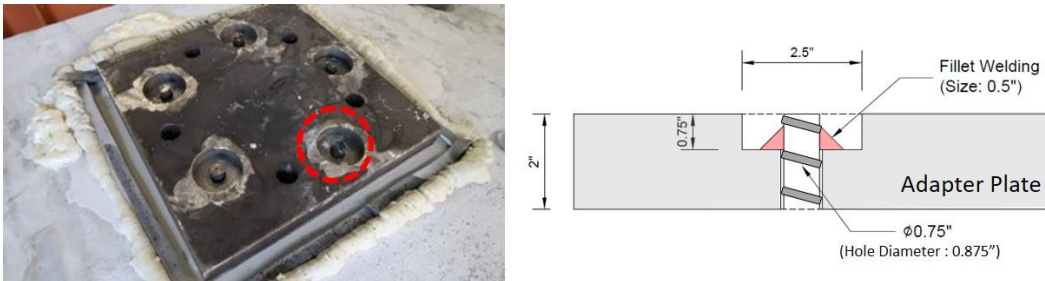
Detail of connection between drilled shaft reinforcement and adapter plate
